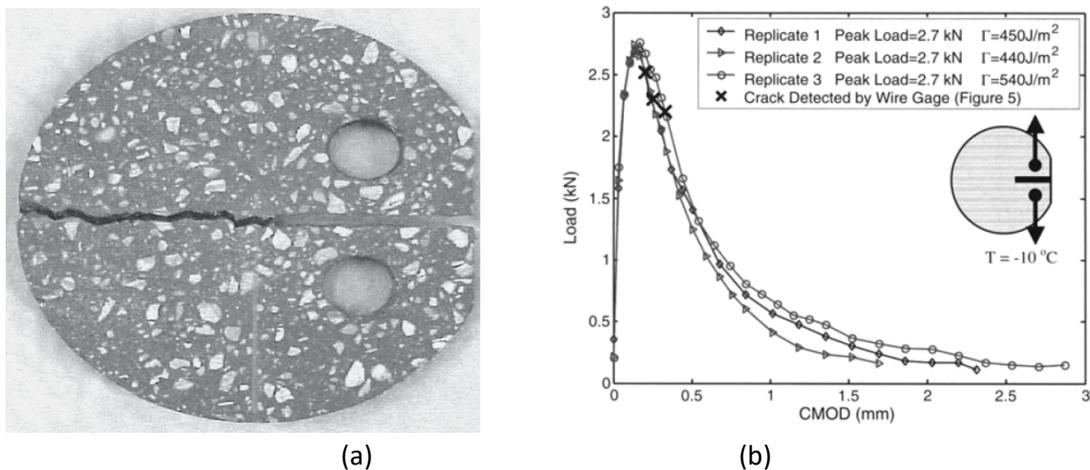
(a) Typical fractured DCT specimen (Wagoner et al., 2005) (b) Typical test curve
